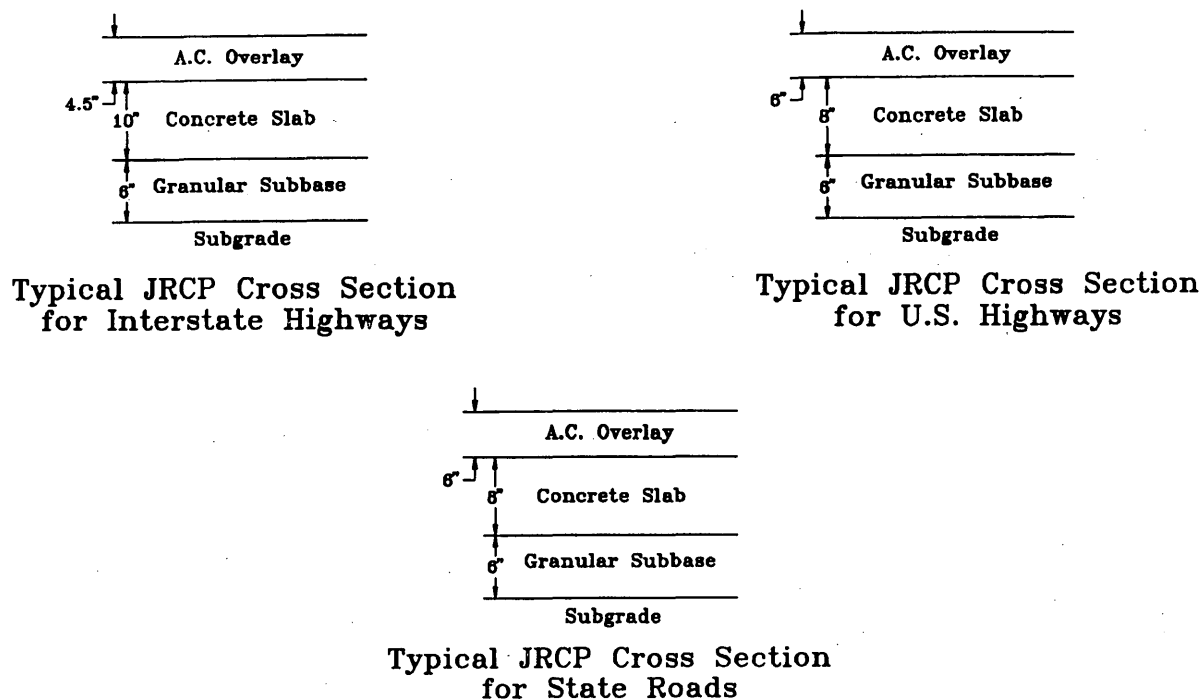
Typical composite pavement cross sections. (1 in. = 2.54 cm).
